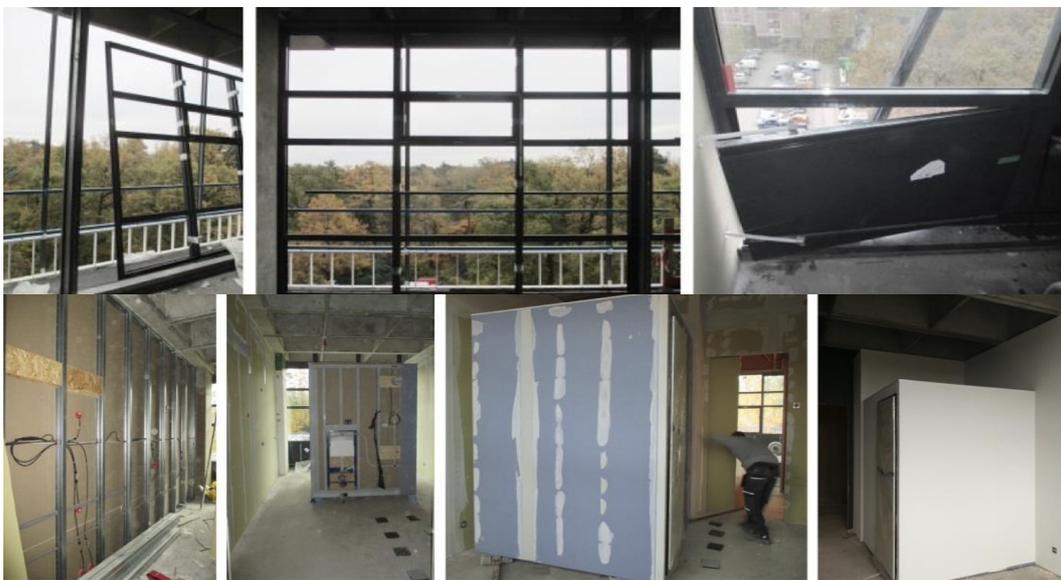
Student apartment renovation: new prefabricated building facade and bathroom unit (Copyright 2018, H2020-INSITER Project Consortium Partnership).
